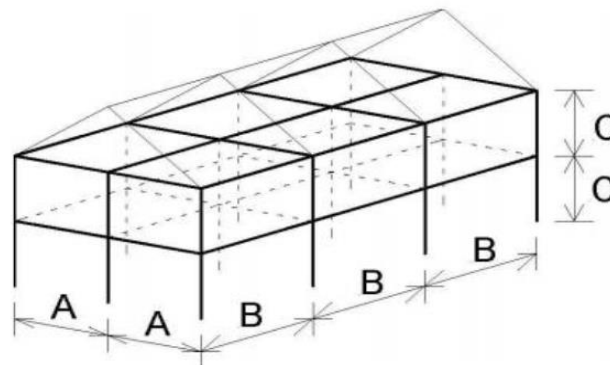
Steel Framed Building A=5.5m B=4m C=3m
